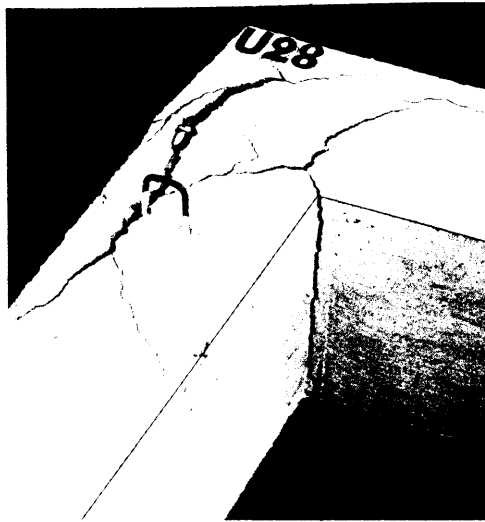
Detail of Corner Crack and Diagonal Cracks after Failure
